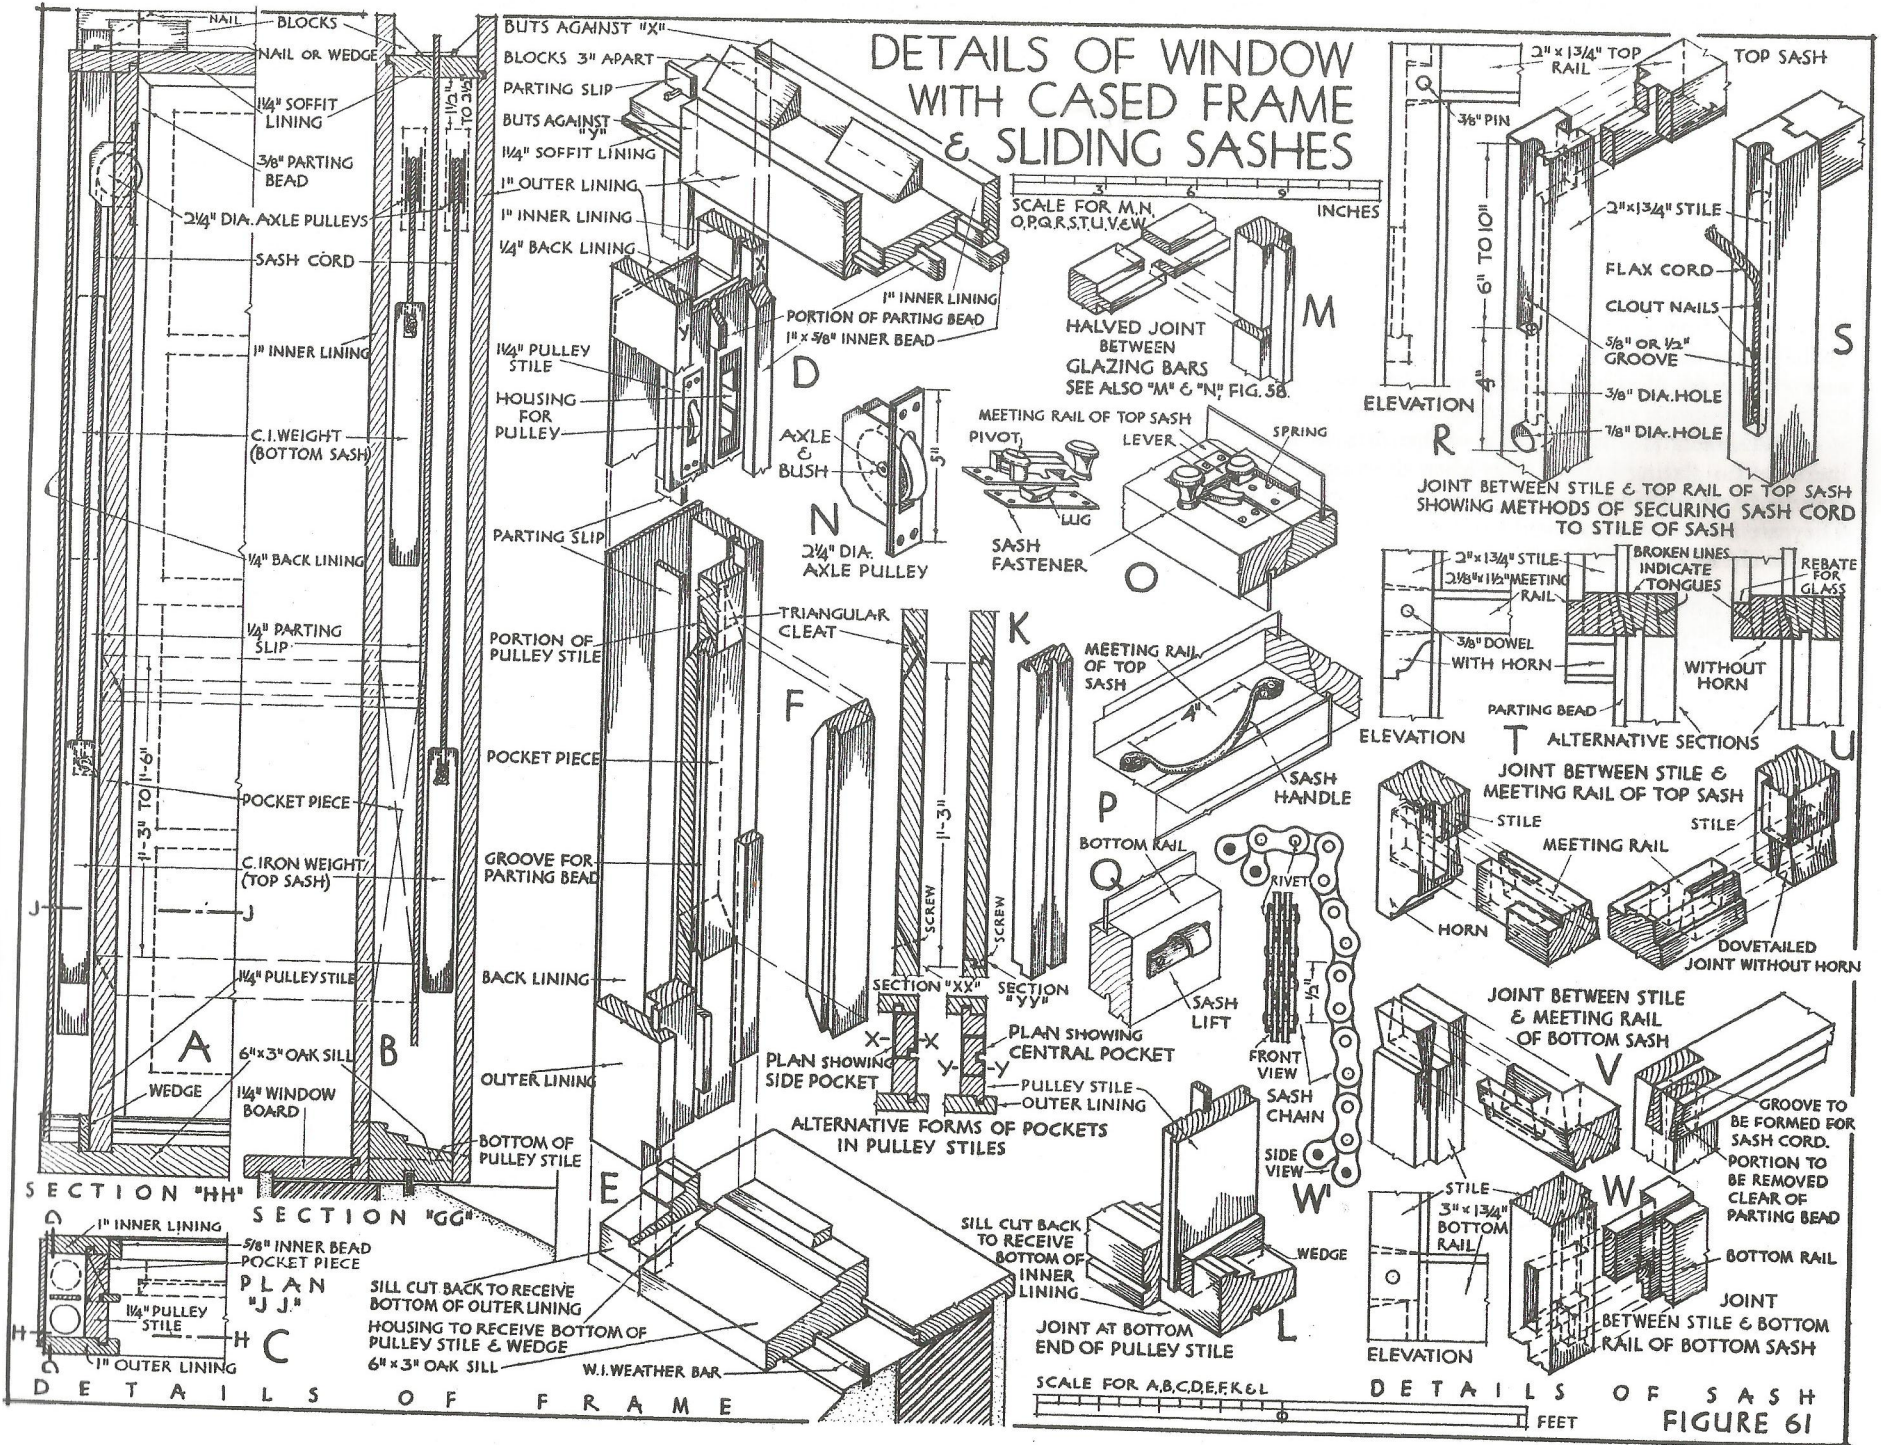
DETAILS OF WINDOW WITH CASED FRAME & SLIDING SASHES
